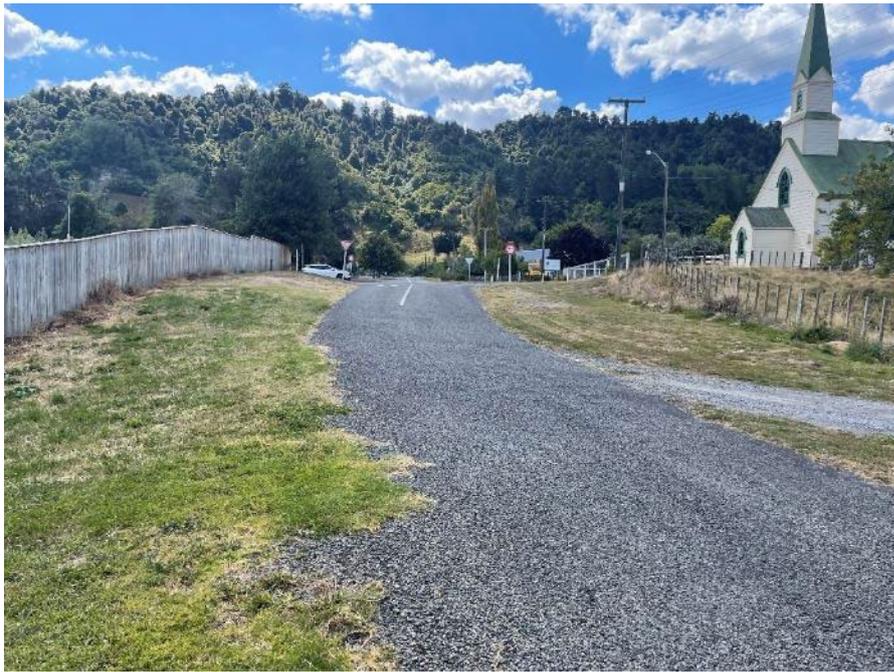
Kereru Street – view north from Weka Street (southern end of Kereru Street)
